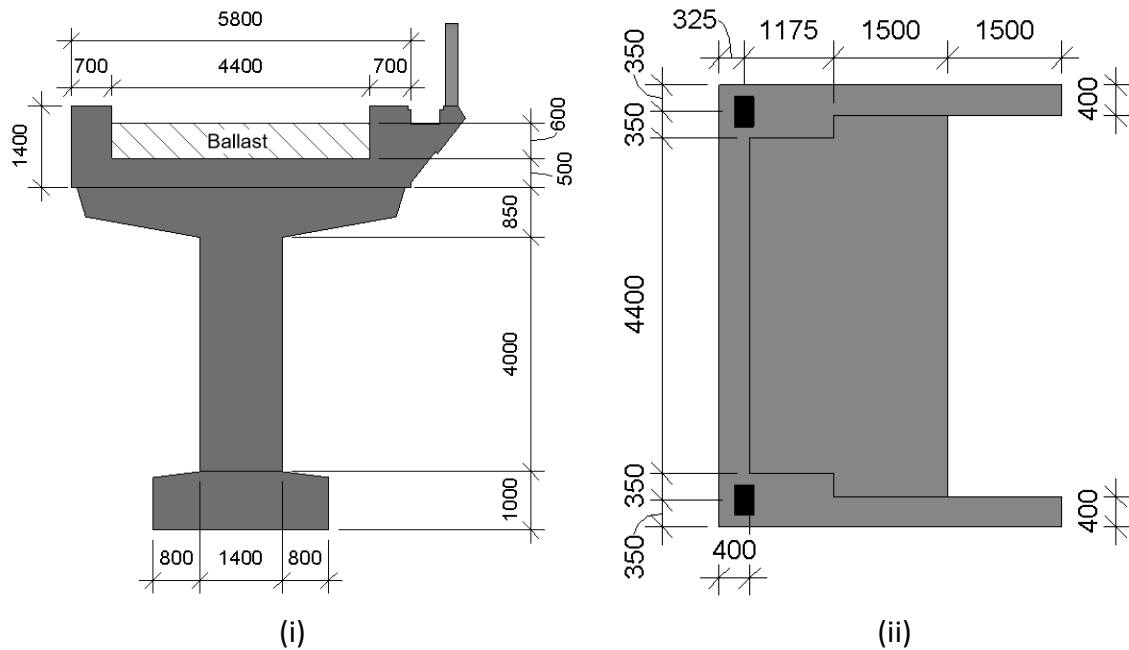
General layout of Stange railway bridge, (i) bridge deck and column cross-section, (ii) abutment plan view.
